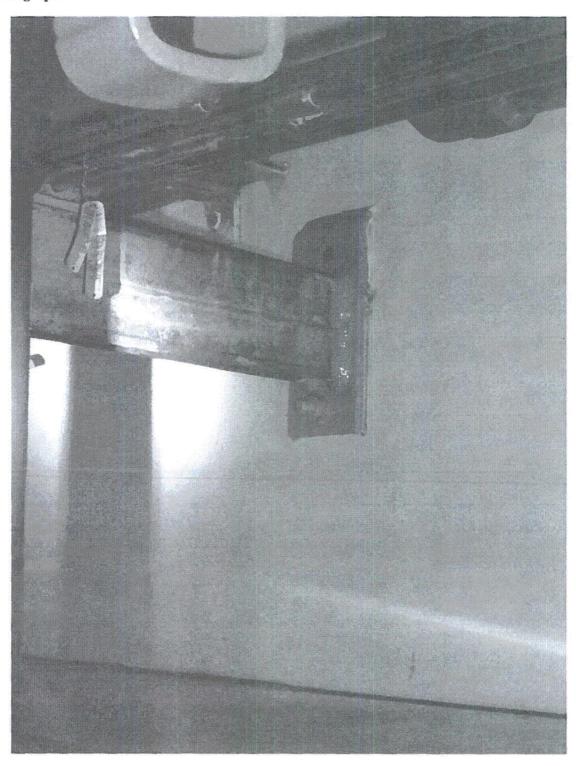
Tubing Support Missing Bolt (NE Diagonal Unit 2)
